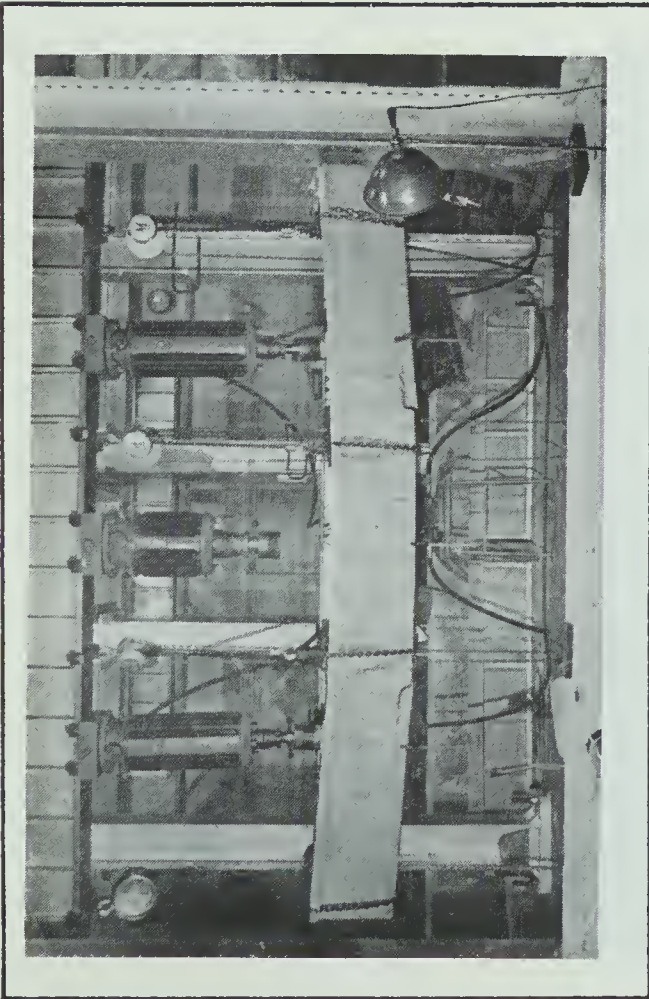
BEAM #1 CRACKING AND FAILURE PATTERNS
